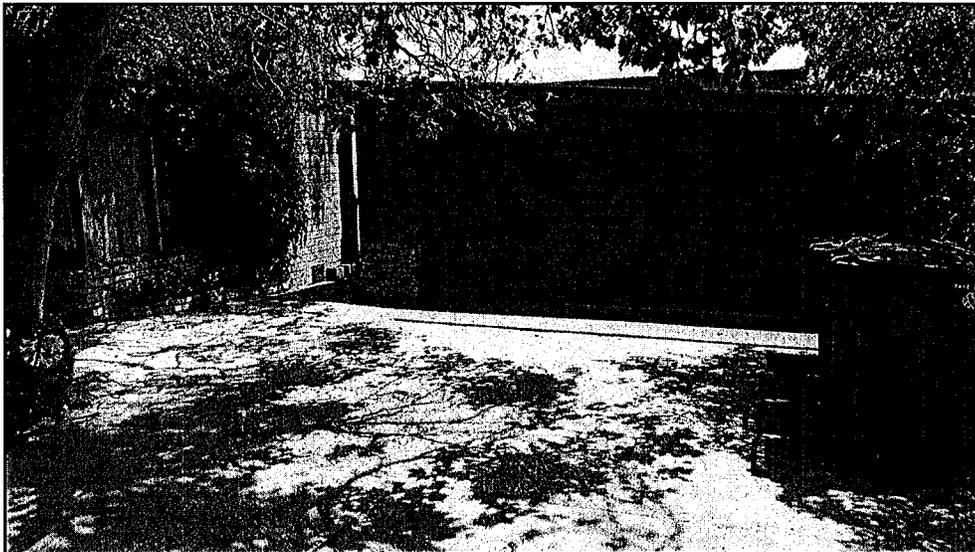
54 Day Road, garage, northern elevation. [5-31-2012]
